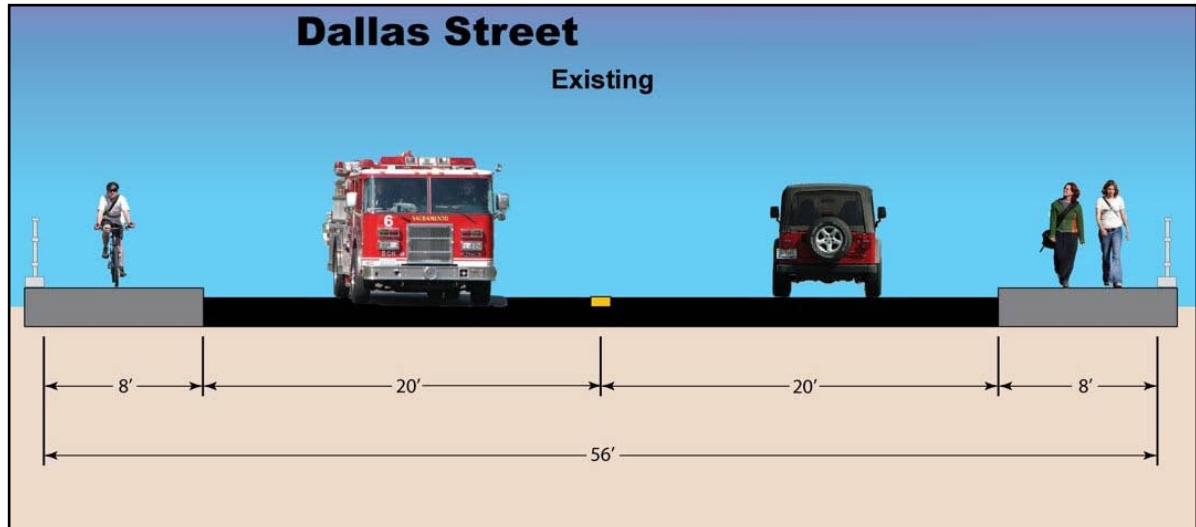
The existing design of the Dallas Street bridge, looking west.
